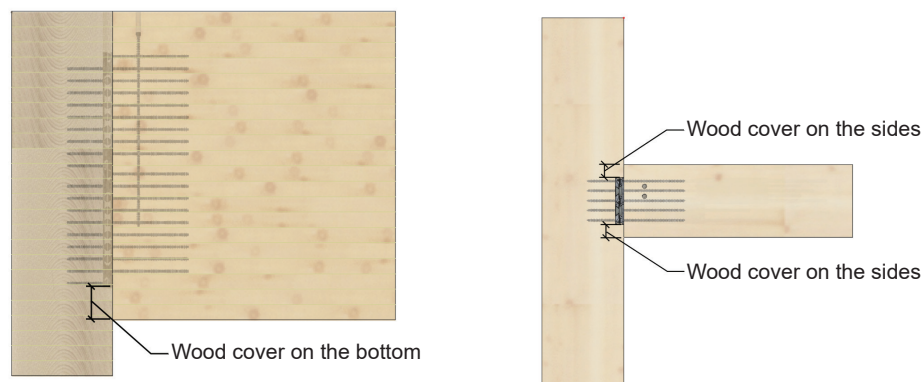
, Wood cover providing one-hour FRR with an 8-3/4in beam. (left) side view, (right) top view
